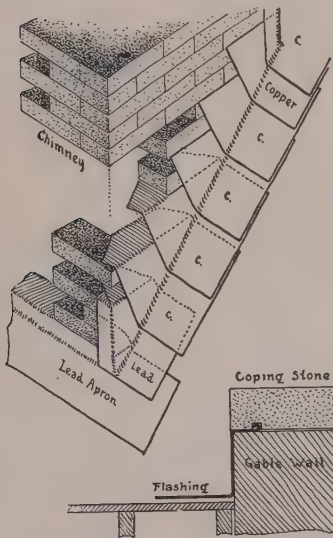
Portion of chimney and section through stone coping, showing the flashing of each
